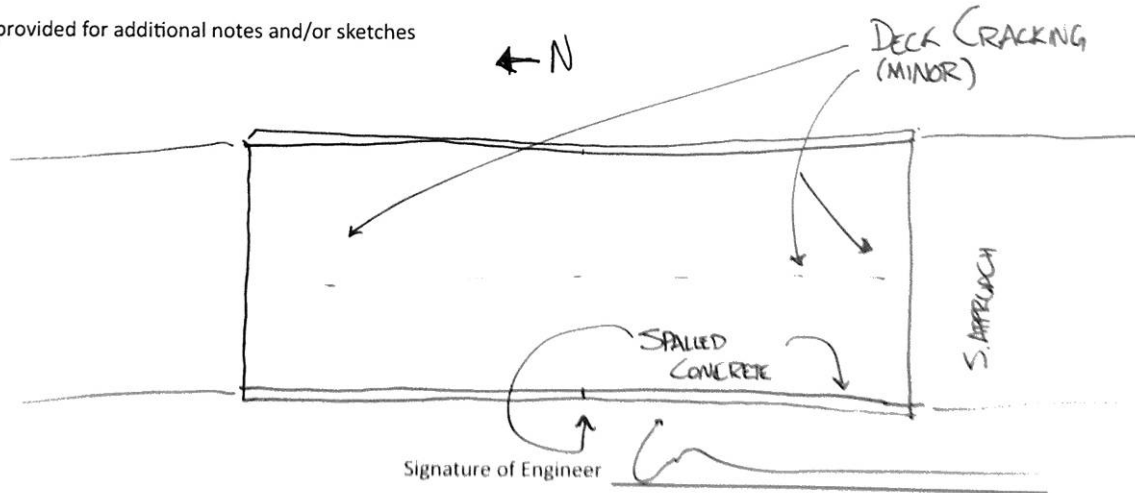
Special Post-Earthquake Bridge Inspection Form (page 2)
